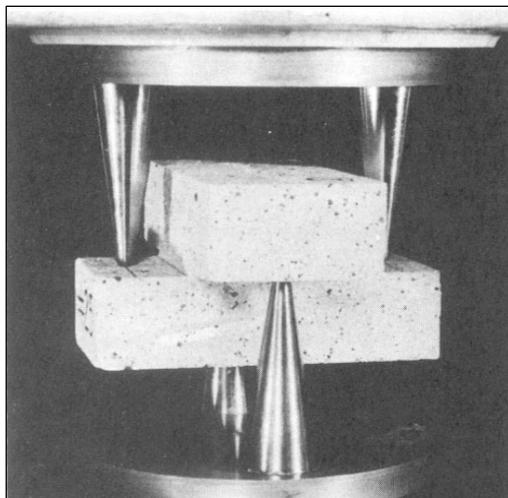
ASTM C 321’s crossed brick specimen in special loading apparatus.
